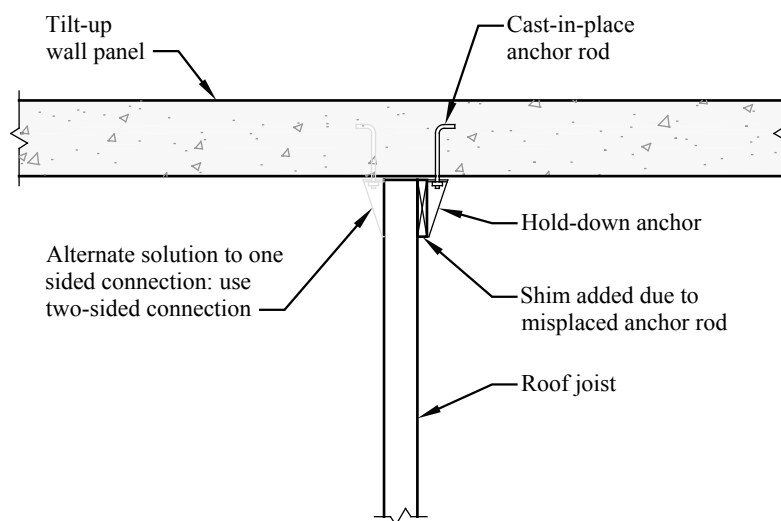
Plan view of wall anchor with misplaced anchor rod.
